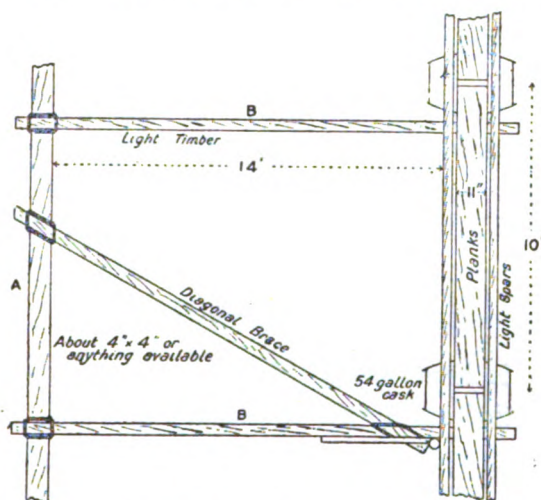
PLAN. LIGHT FOOTBRIDGE OF CASKS AND SPARS. LASHINGS OMITTED.
